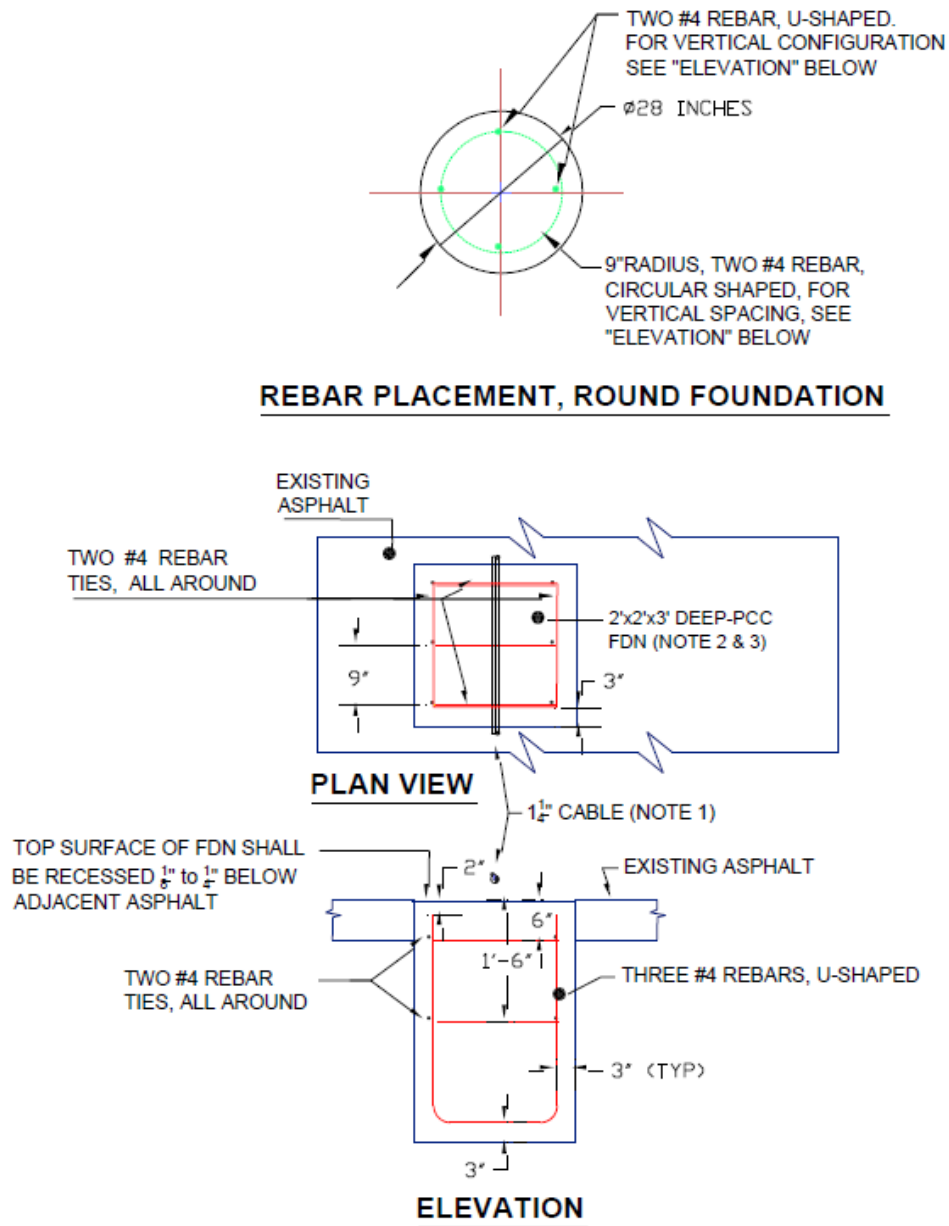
Locally Manufactured Cable Tiedown Anchor
